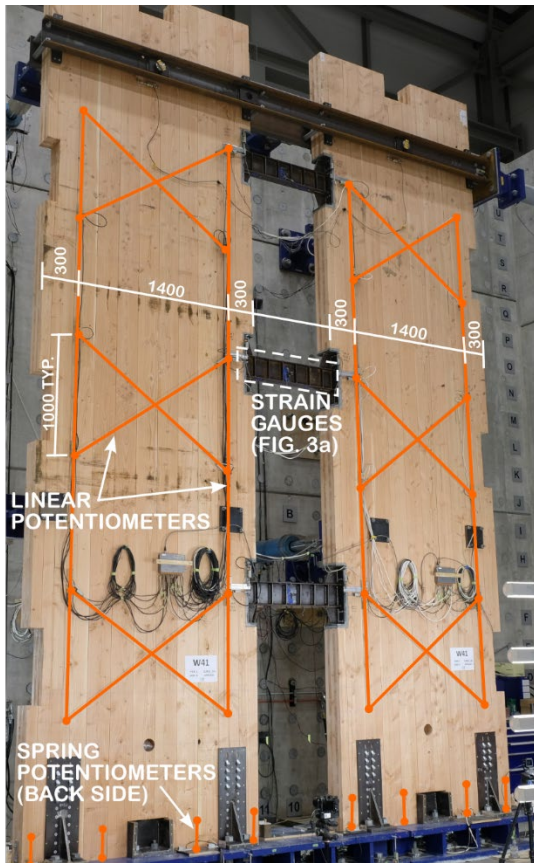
Primary instrumentation installed on coupled CLT wall specimen.
